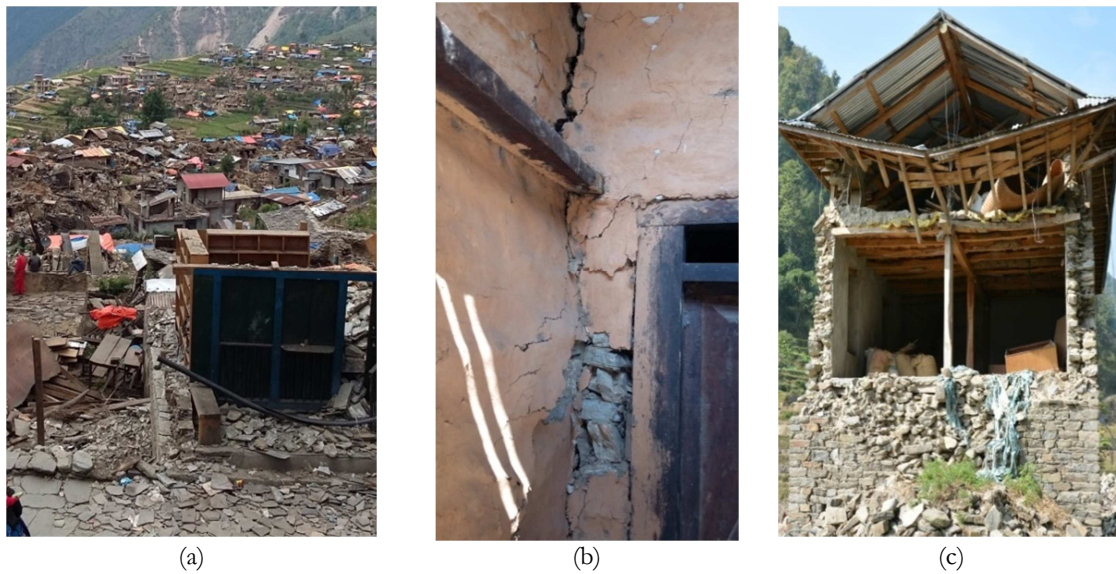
Damage in rural stone masonry buildings; (a) More than 95% of building collapsed in the epicentral Barpak village, (b) Separated orthogonal walls and (c) Out-of-plane collapse of structural and gable end walls
